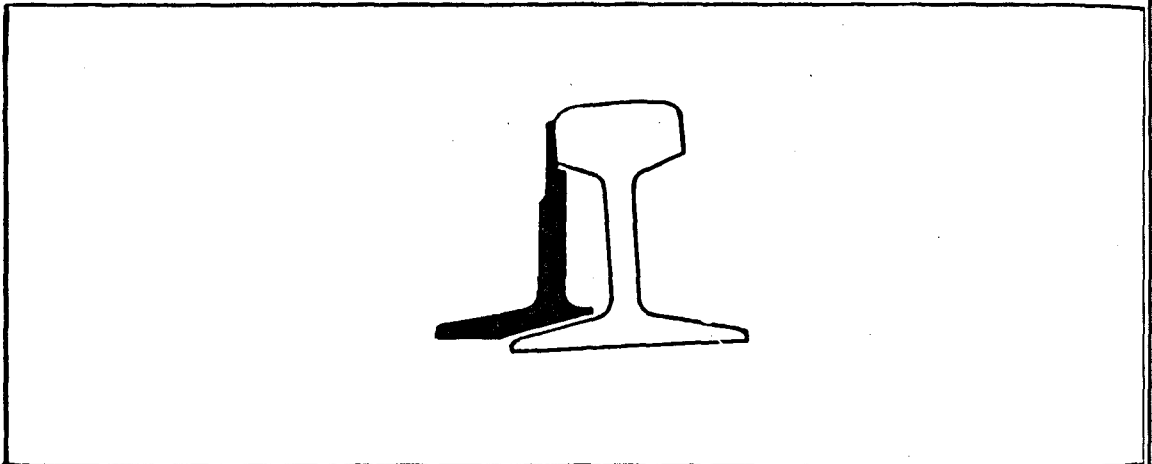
POINT BASE & SWITCH TOE SECTIONS
